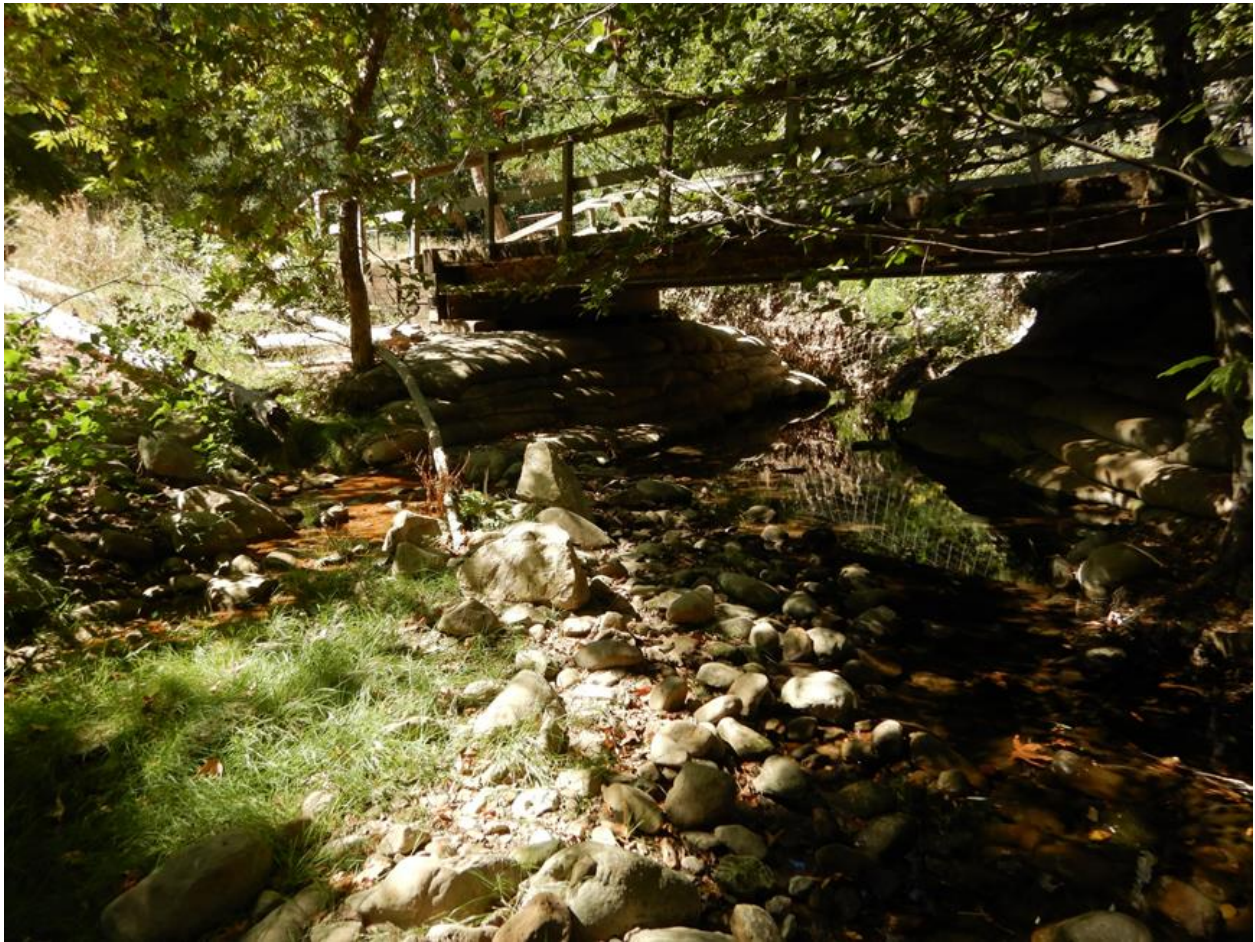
Pre-project condition looking south under the sub-standard temporary bridge with damaged low flow culvert below.
